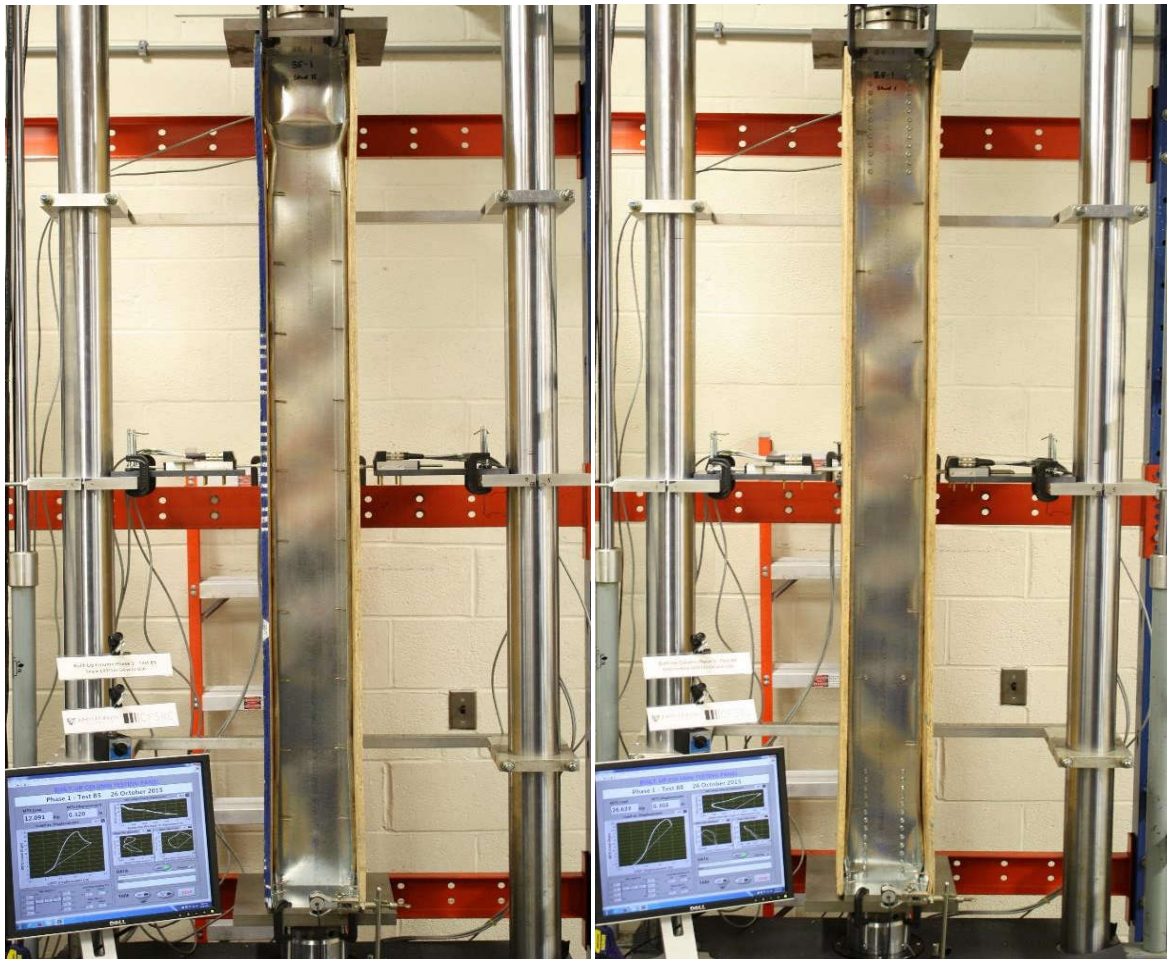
Typical single stud (left, trial B5) and built-up column (right, trial B8) web local buckling failures.
